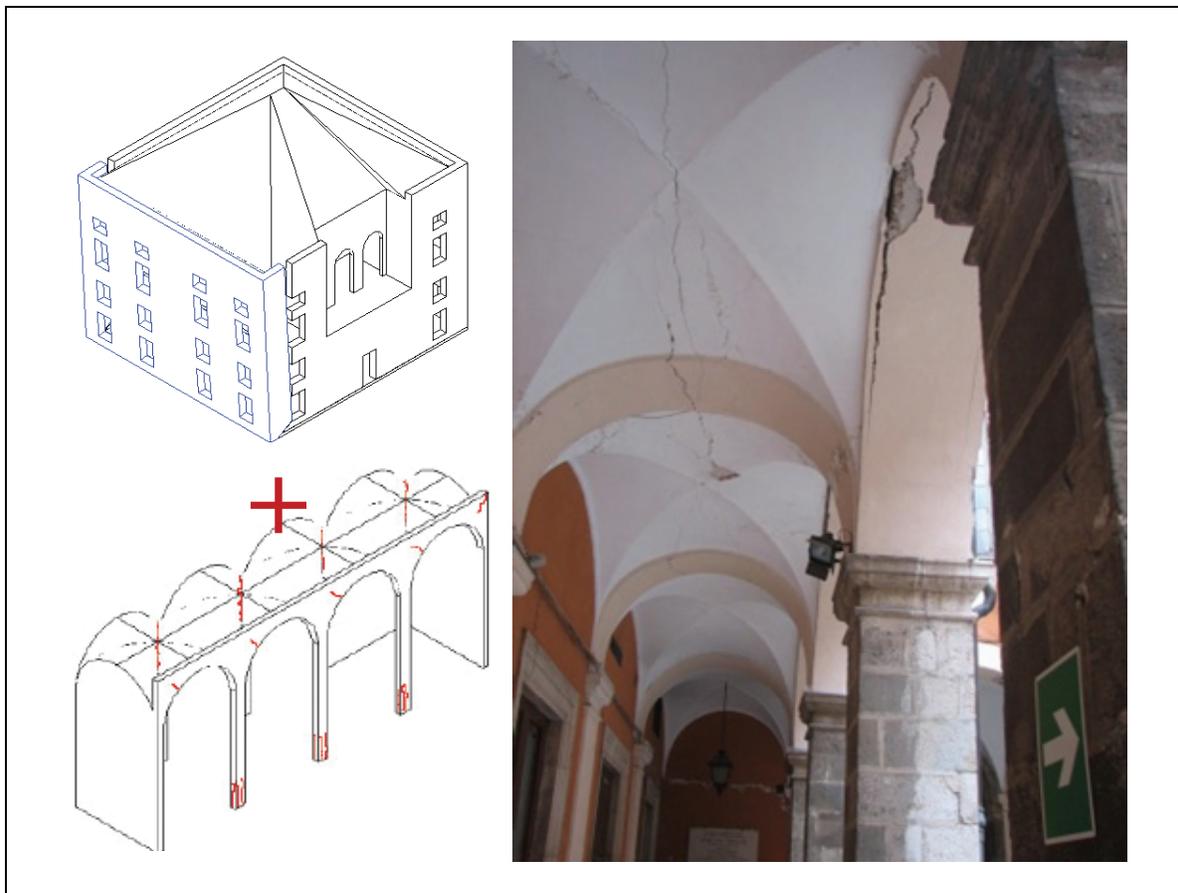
Overturning of the internal walls in the courtyard and longitudinal cracks in the vaults of the Arcade without tie rods (North wing of Via Bafile)
